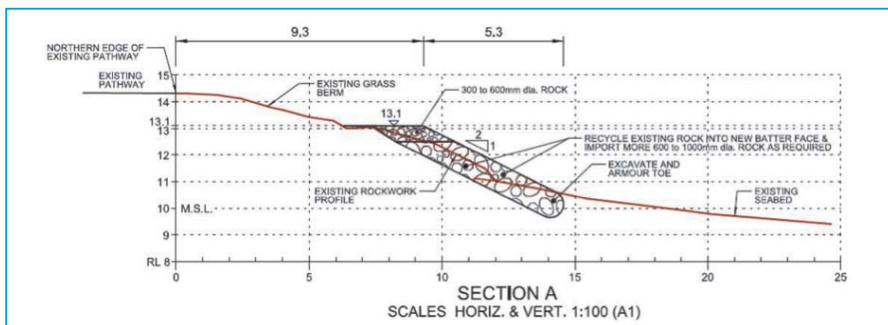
Proposed repairs to the Hardinge Road revetment (Napier City Council).
